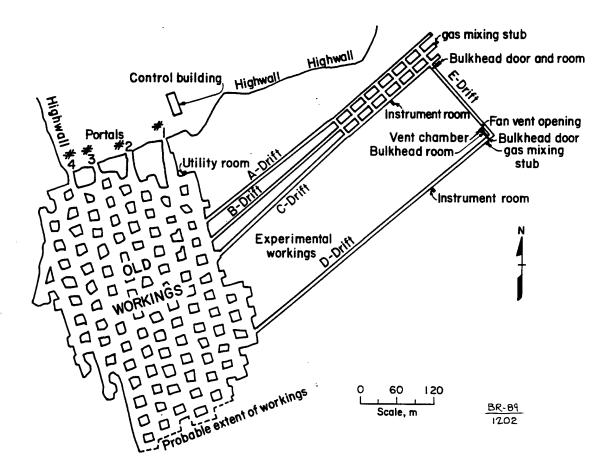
Plan view of the underground facilities at Lake Lynn Laboratory.
